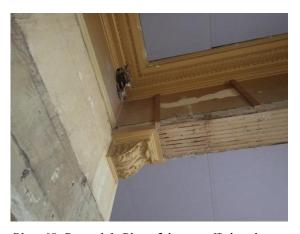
Room 1.1, Phase 2 beam soffit brackets at widened access into former Boudoir.
